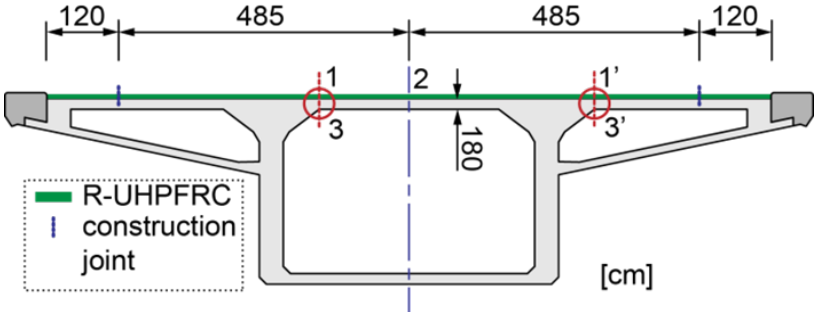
Geometry of the box girders cross-section (thickness of R-UHPFRC layer: 50mm over piers and 40mm in the spans).
